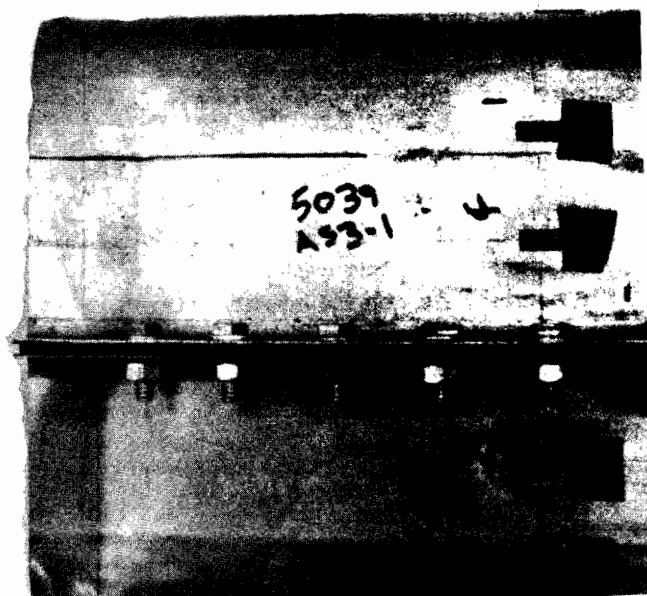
Typical Wrinkling Failure in an ASI3 Stub Column Specimen
